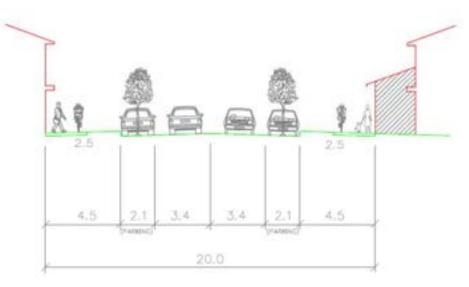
Coode Street: Walter Road West to Walter Road West
